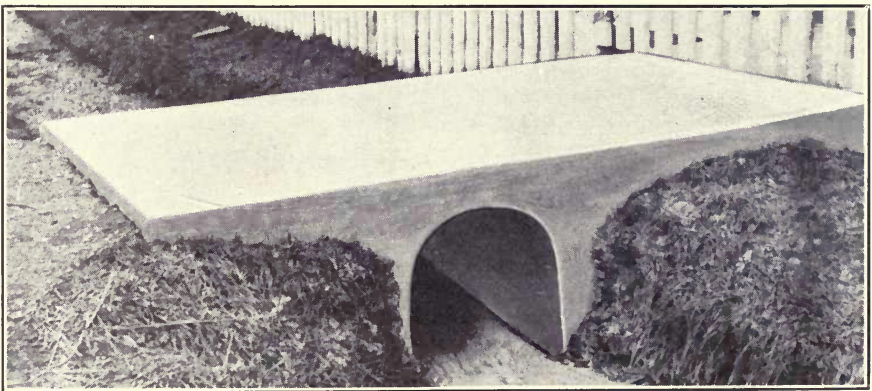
CONCRETE CROSS-WALK OVER GUTTER.
